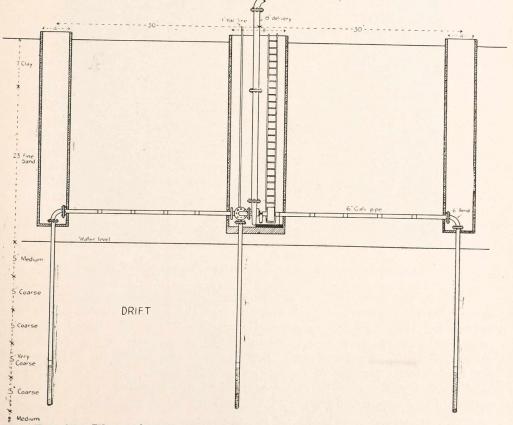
Illustrating concrete cylinder construction now commonly used in the Burdekin area. The cylinders are cast above ground level and lowered as the earth within is excavated.
